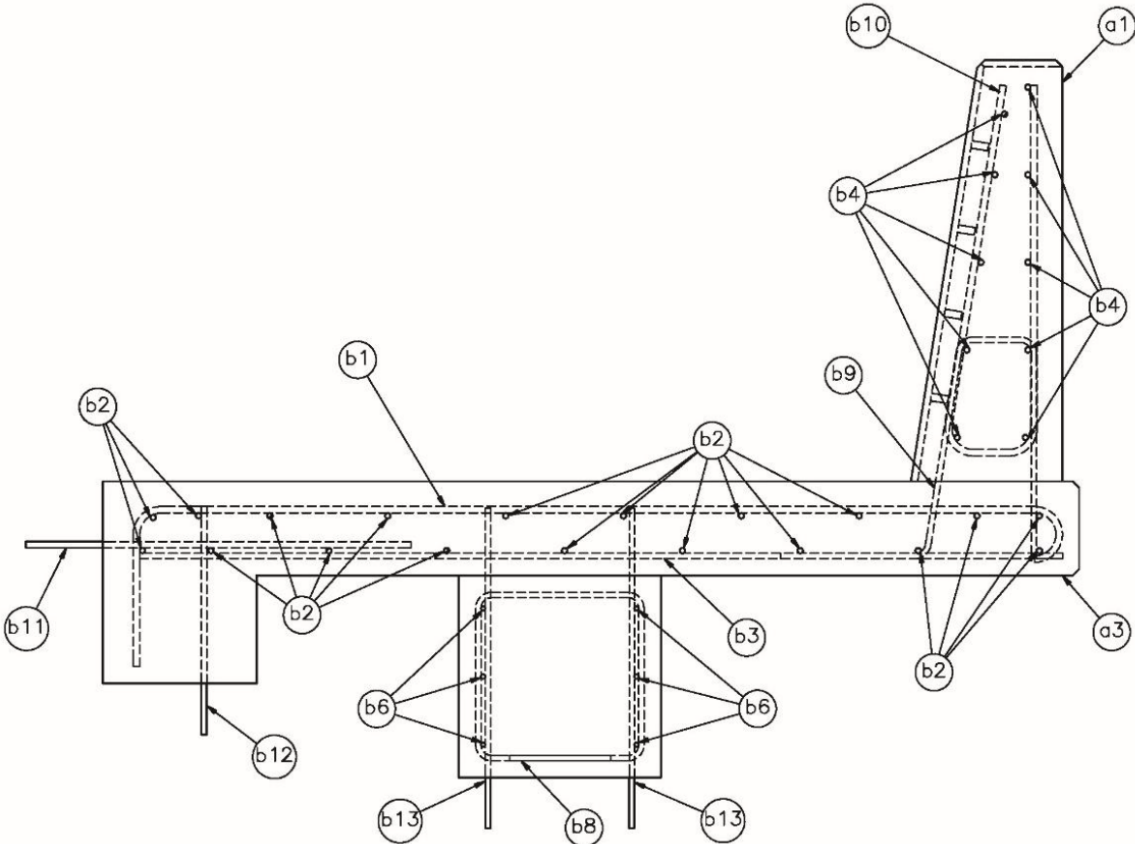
TL-5 Manitoba Tall Wall Deck Configuration [11]
